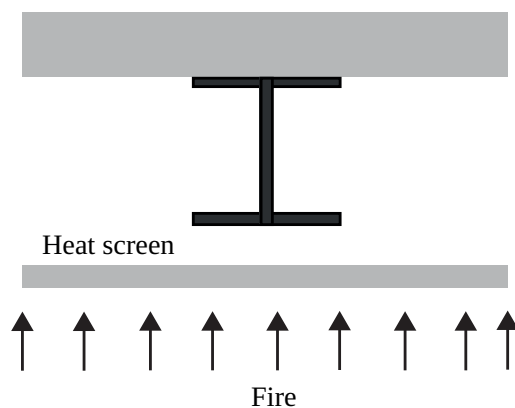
Steel beam with a heat screen underneath (elevation)
